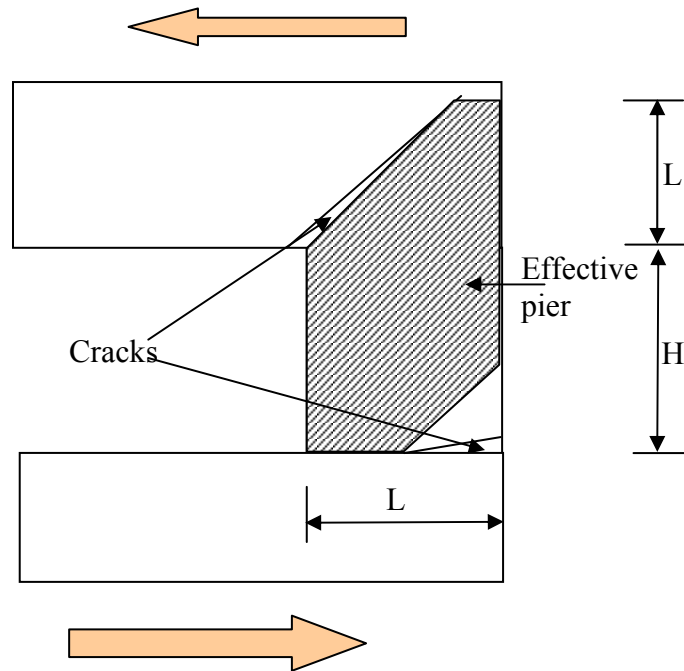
Effective pier of an exterior door pier when loaded from right to left
